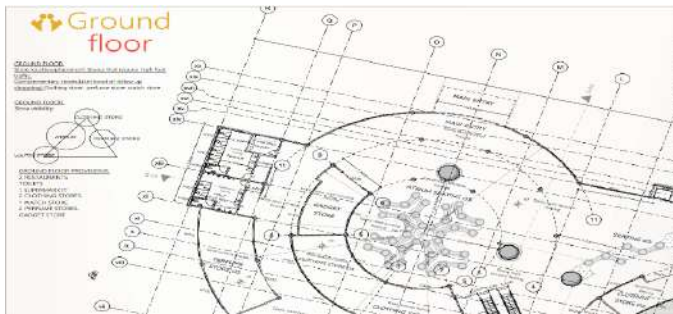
Section of ground floor plan highlighting the entry section and atrium.. Source: Author, 2024.
